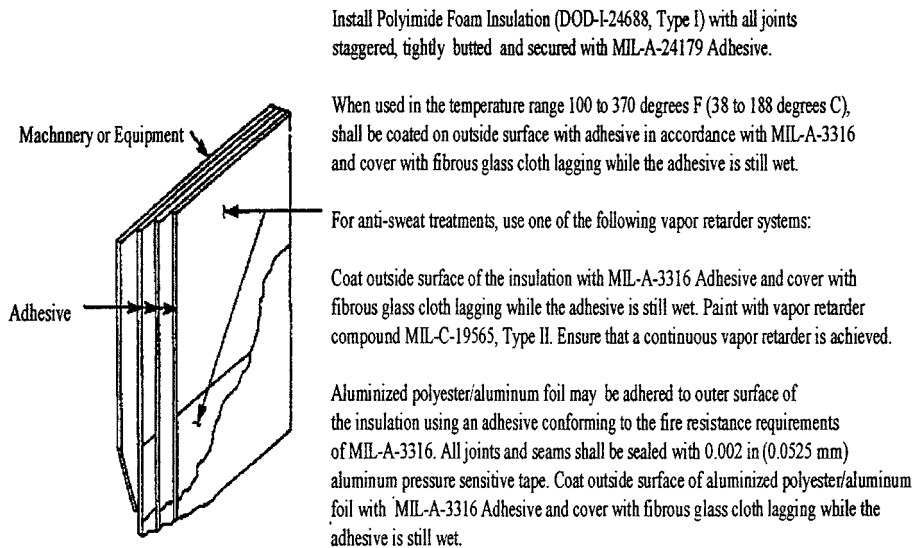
Installation of Polyimide Foam Insulation (DoD-I-24688, Type I) on Machinery and Equipment
